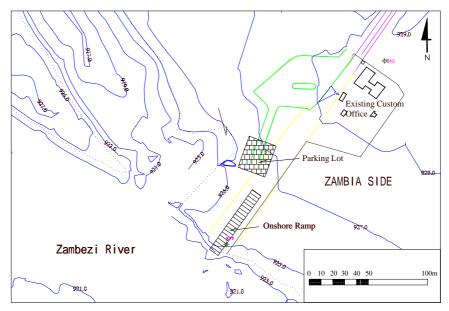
(1) Location of Onshore Ramp (Zambia Side)
